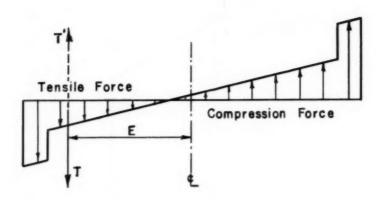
FORCE DIAGRAM ON FOUNDATION FOOTING
